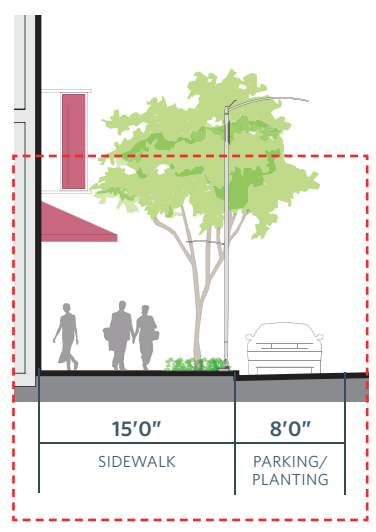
Typical section of the Retail Street, east of Primary Retail Street
